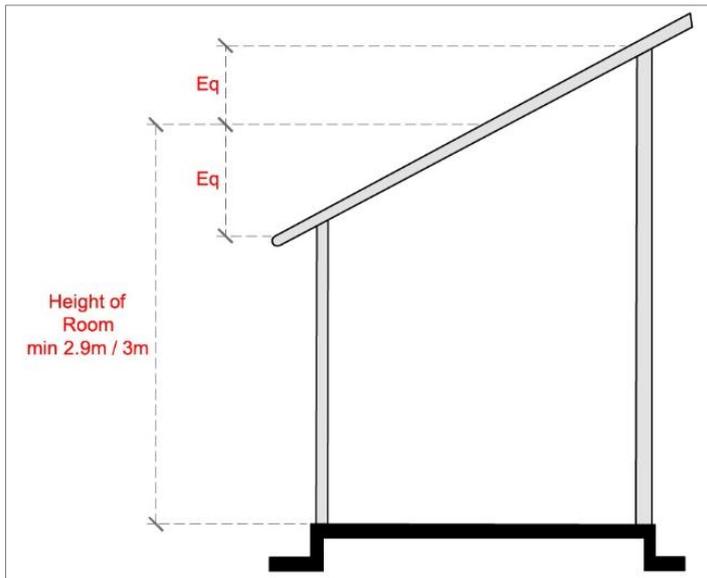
Minimum Clear Height for Sloping Roof
